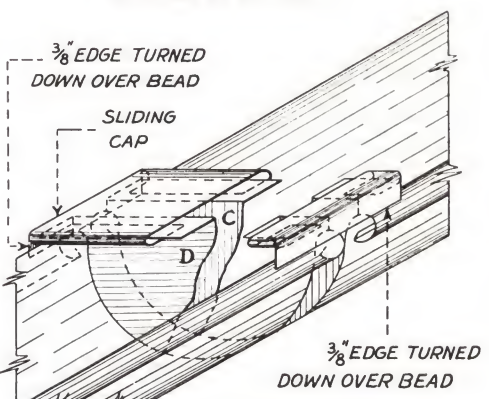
METHOD OF CONSTRUCTING EXPANSION JOINT IN EAVE TROUGH
